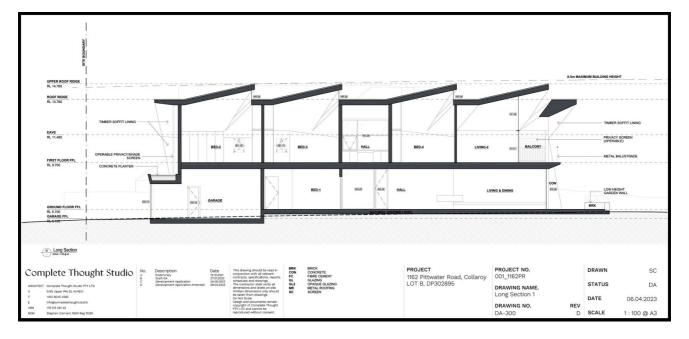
Drawing from Complete Thought Studio, showing a cross-section through the site and proposed building.
